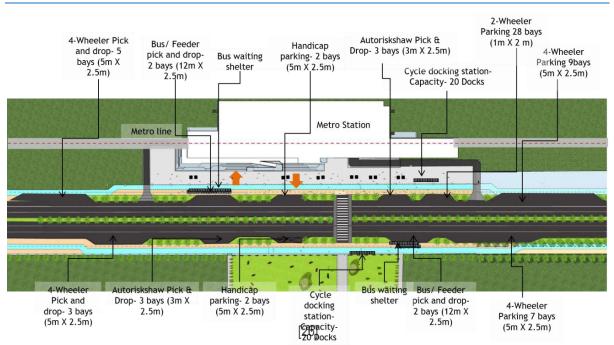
DETAILED REQURIEMENTS FOR PICK AND DROP FACILTIES
